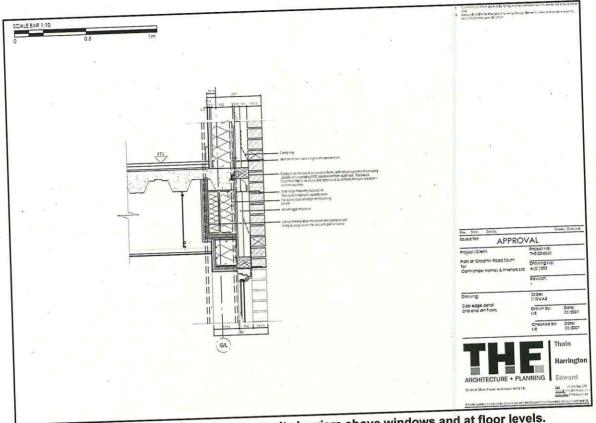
Sectional detail showing cavity barriers above windows and at floor levels.
